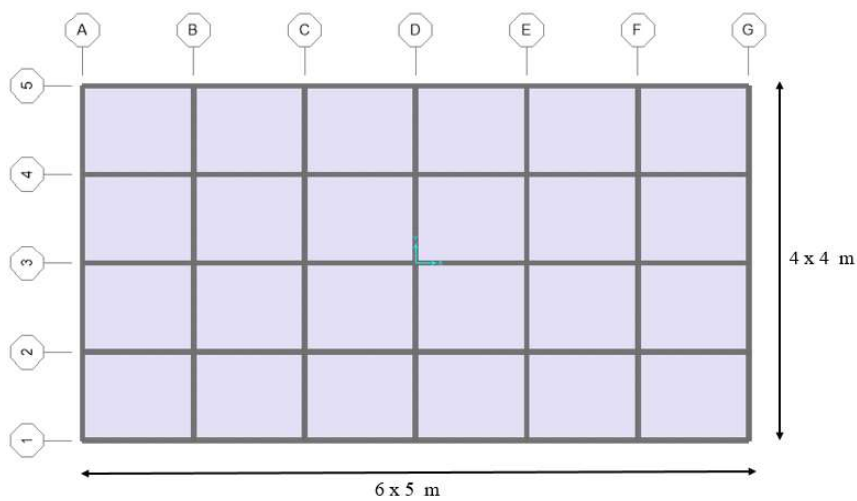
The plan view of the 10-story steel structure with 1026 members.
